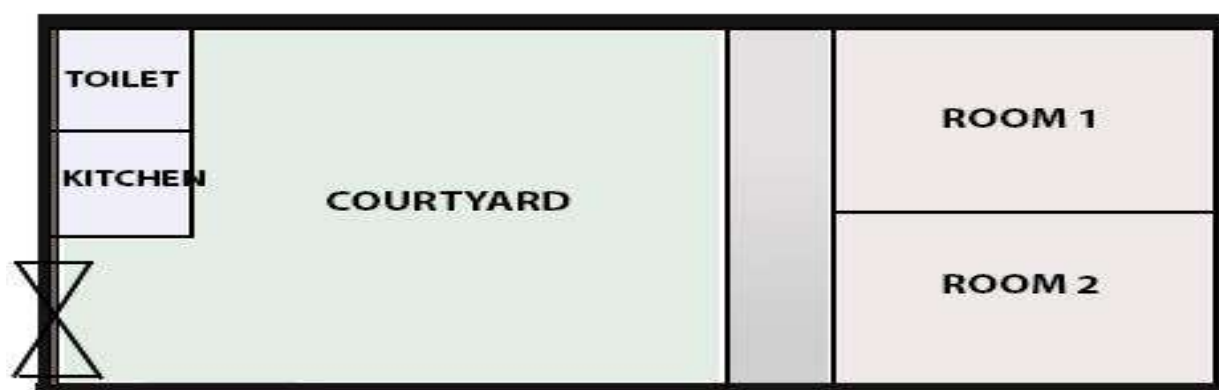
House Layout in Model Village Rakh Jalwala, (Source: Field Survey 2020)
